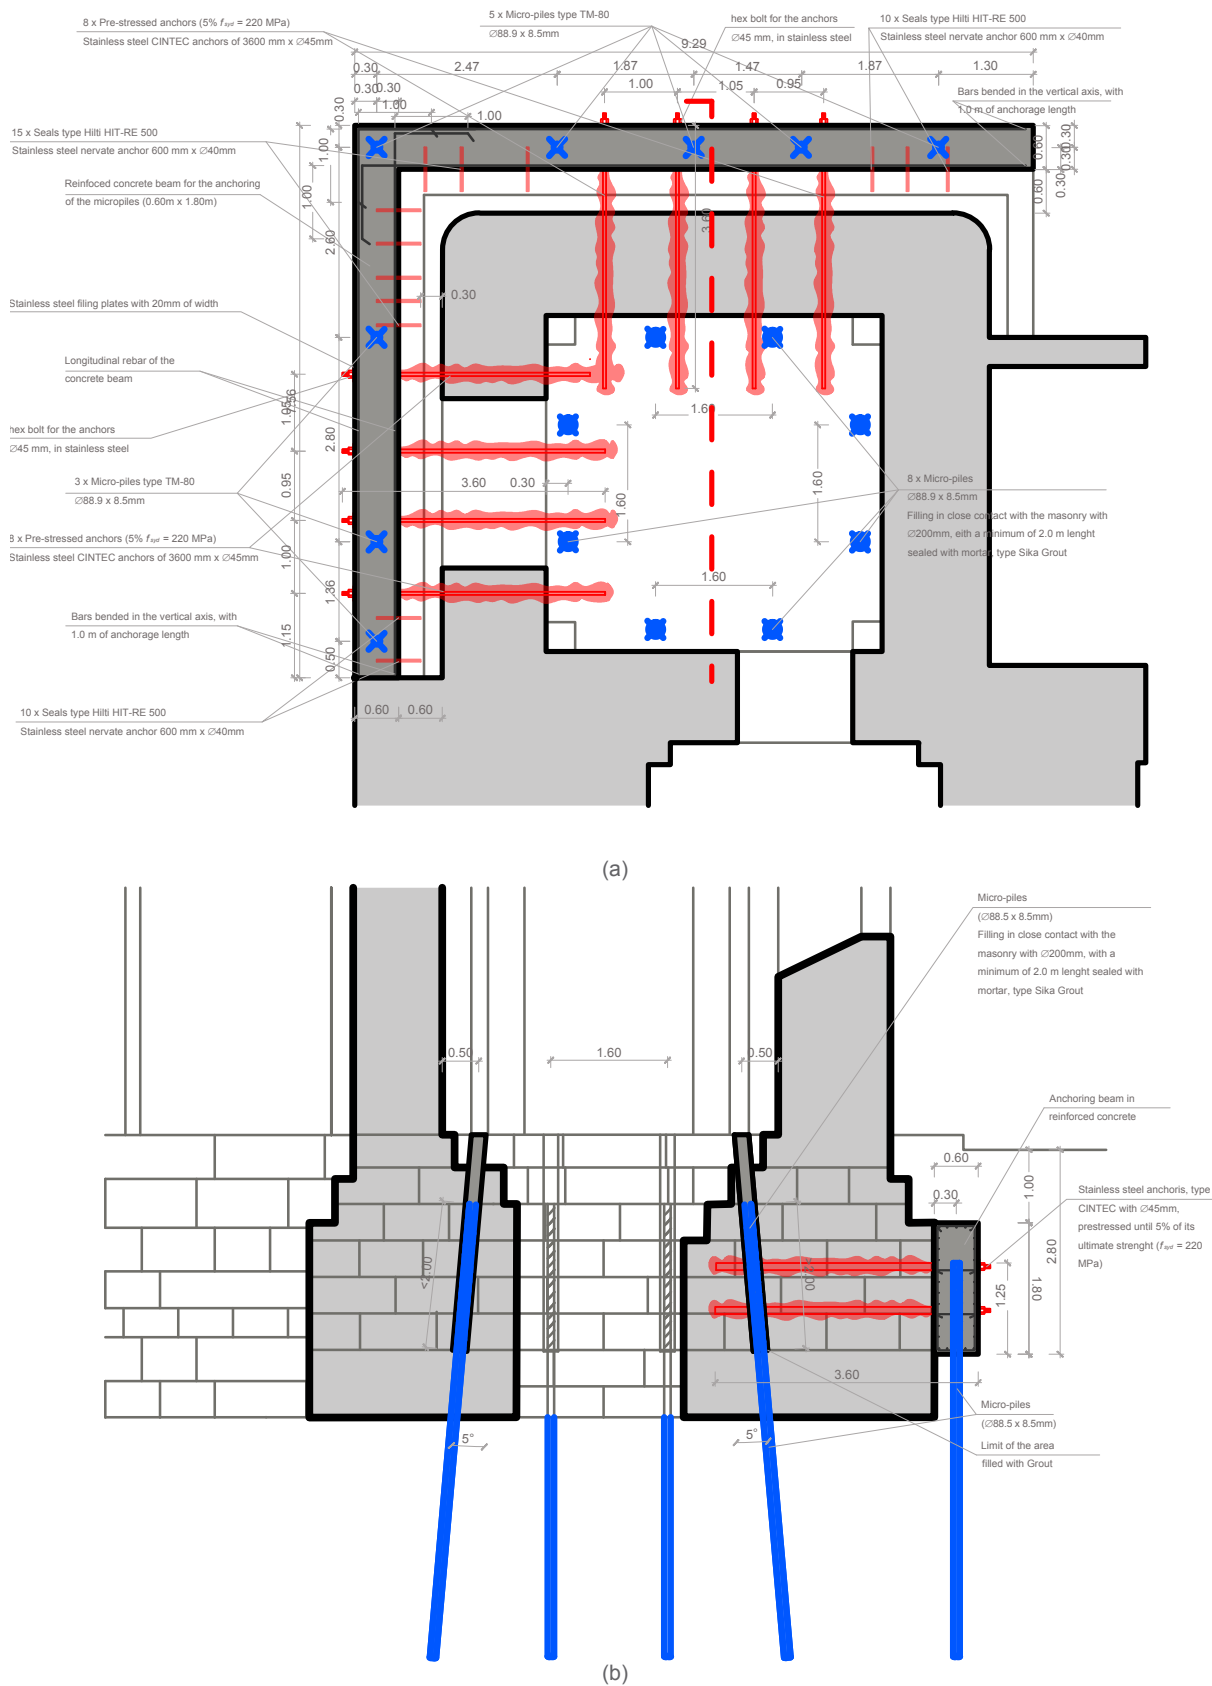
The system of foundation strengthening designed: (a) plant (b) section
